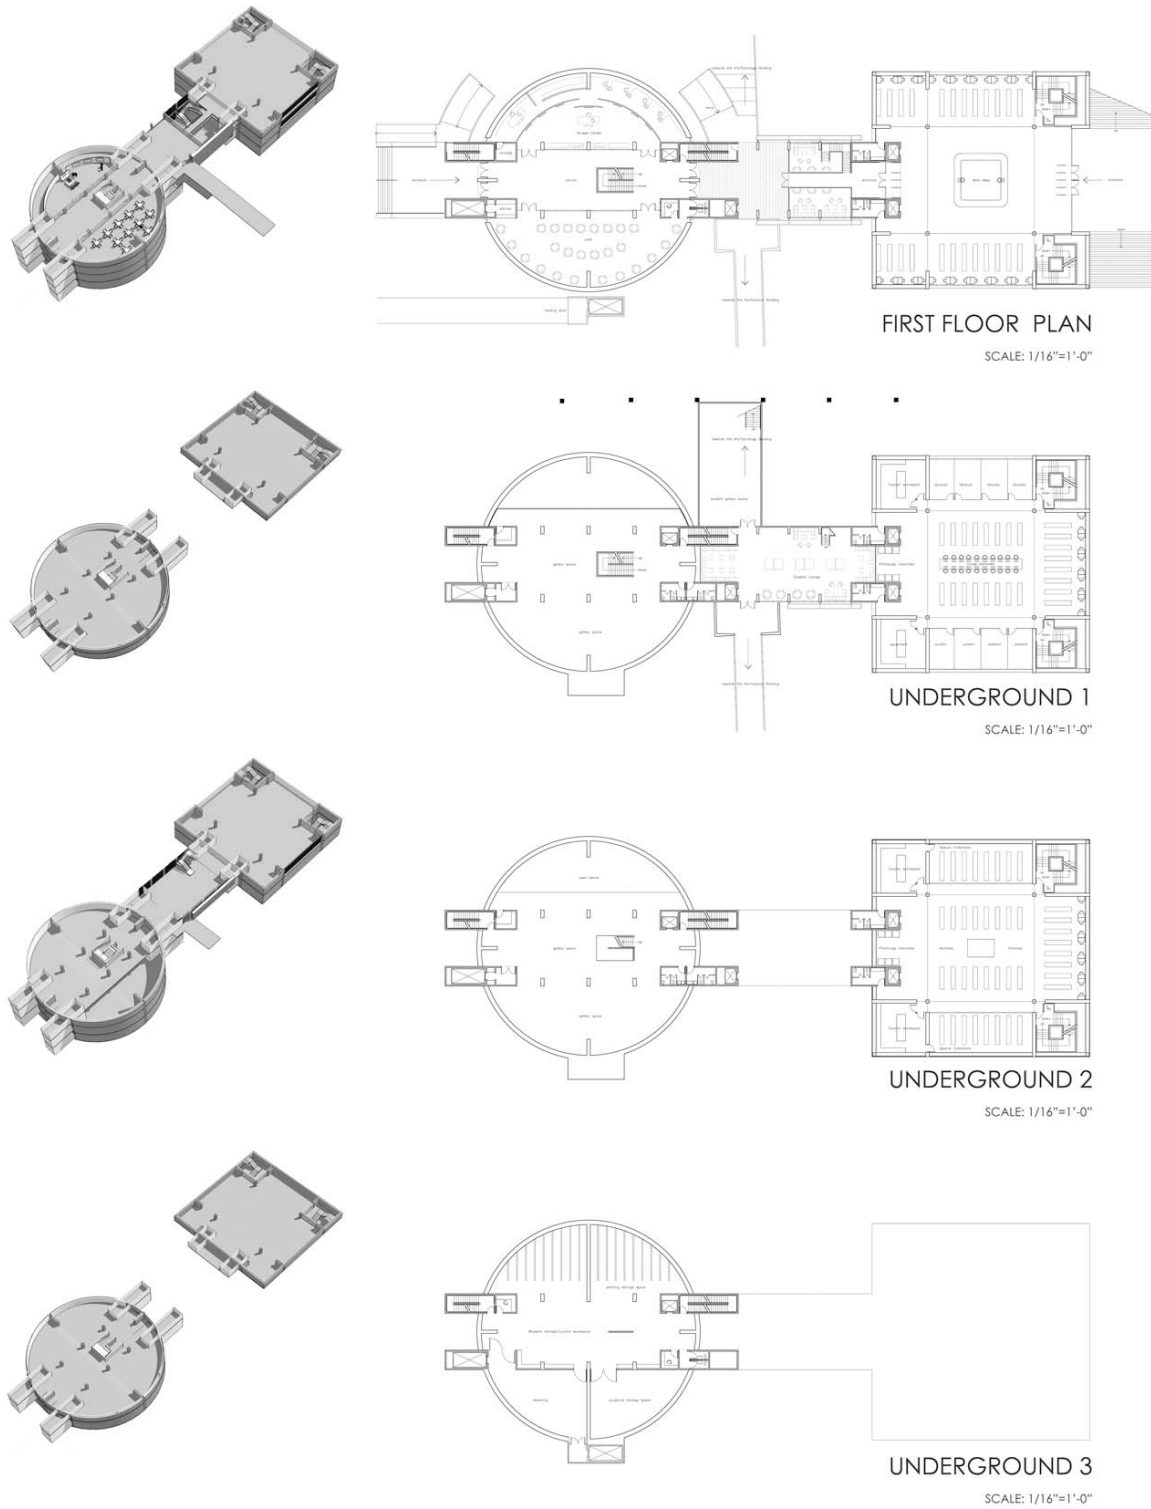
Plans from first floor plan to underground #3. (Author's drawing)
